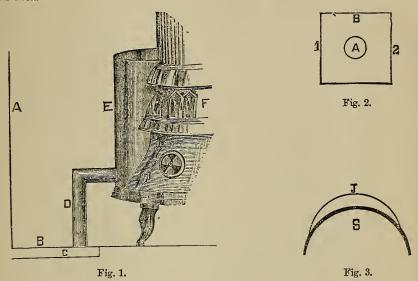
A, wall of room; B, floor; C, box to convey outdoor air against the stove; D, stove-pipe six inches diameter, fastened to jacket E; E, sheet iron jacket 16 inches wide, 18 or 20 inches high, between which and the stove the air is heated, and passes into the room; F, F, stove.
